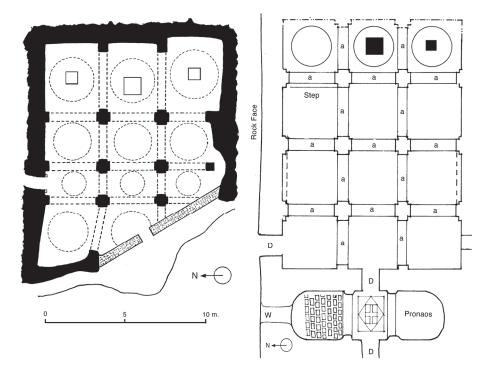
Church of Emäkina Mädhane 'Aläm, Wällo, floor plan; drawing by Zara Thiessen
